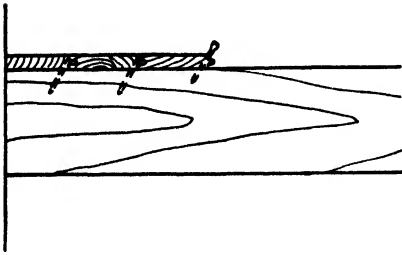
Draw nailing. Driving the nails at an angle helps to draw the boards tightly together.
